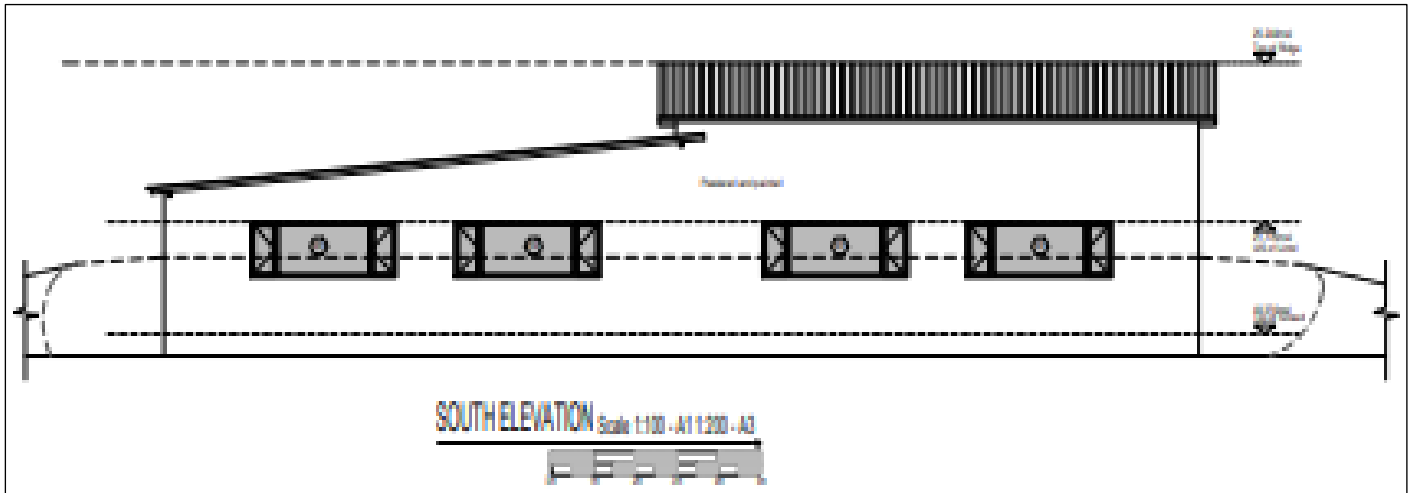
South elevation of the proposed new garages (TMBA, 2023)
